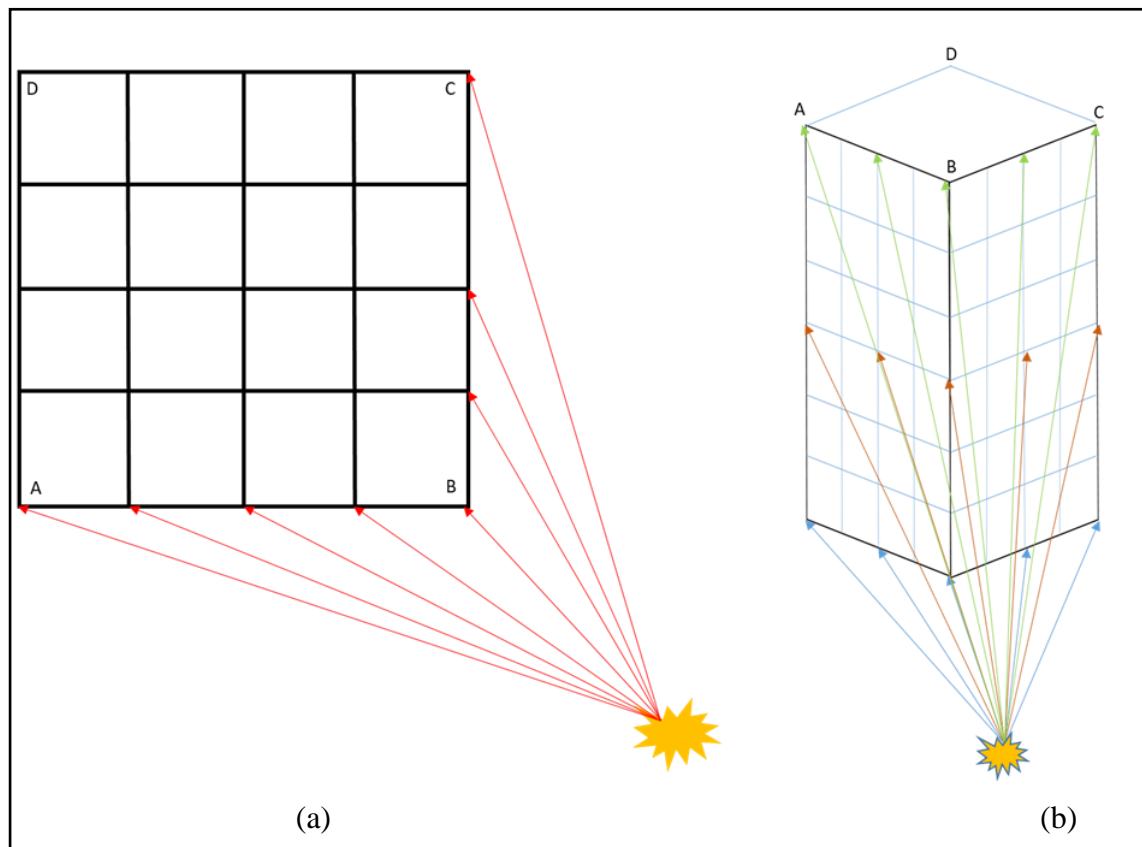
Blast at corner side of the building (a) plan view (b) 3D view
